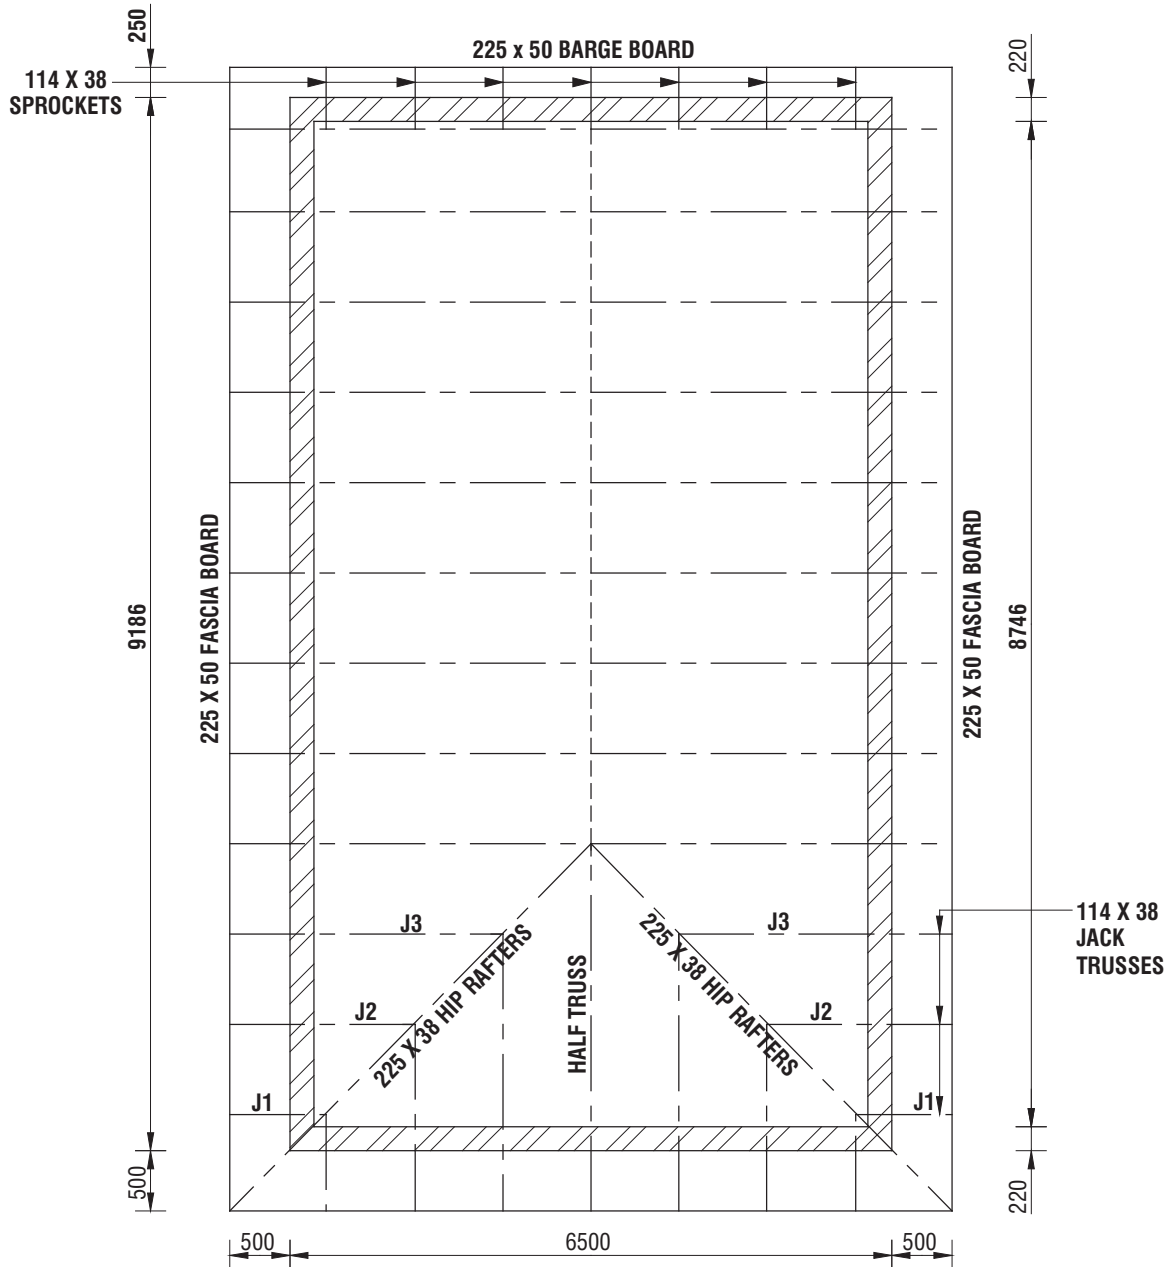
PLAN VIEW OF ROOF CONSTRUCTION
